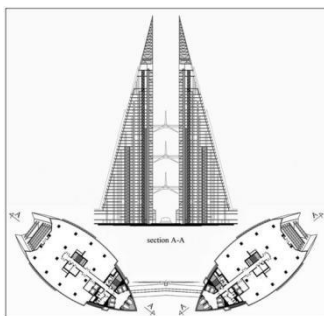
Bahrain World Trade Centre: Floor plan and section integrated architectural and structural design solutions, such as modern skyscrapers
